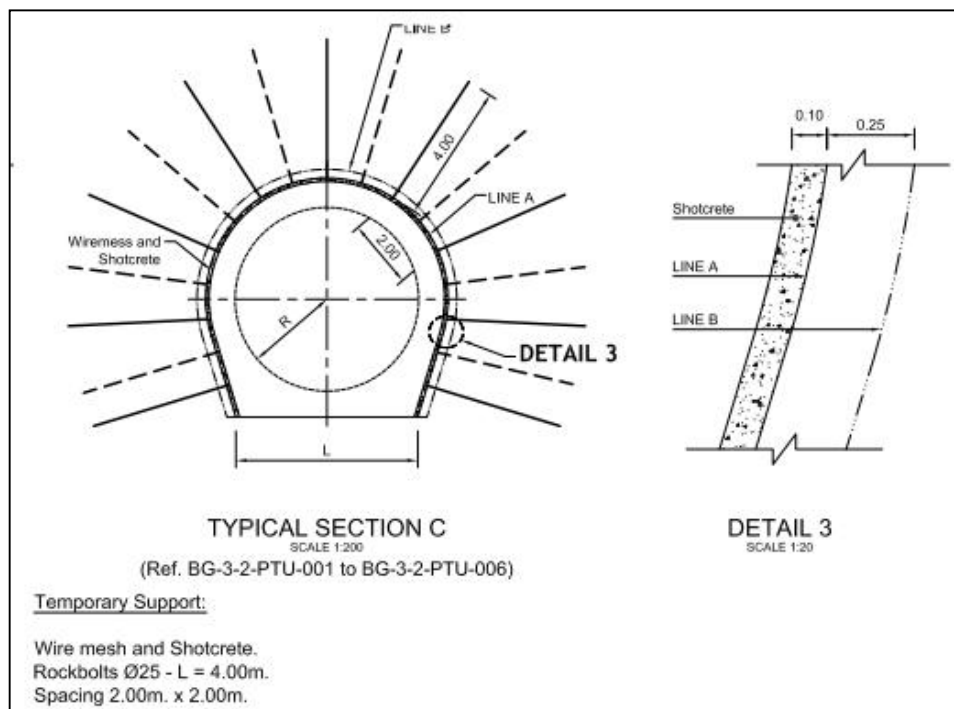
Rock Support -Typical Section (extract Ref PTU-012)
